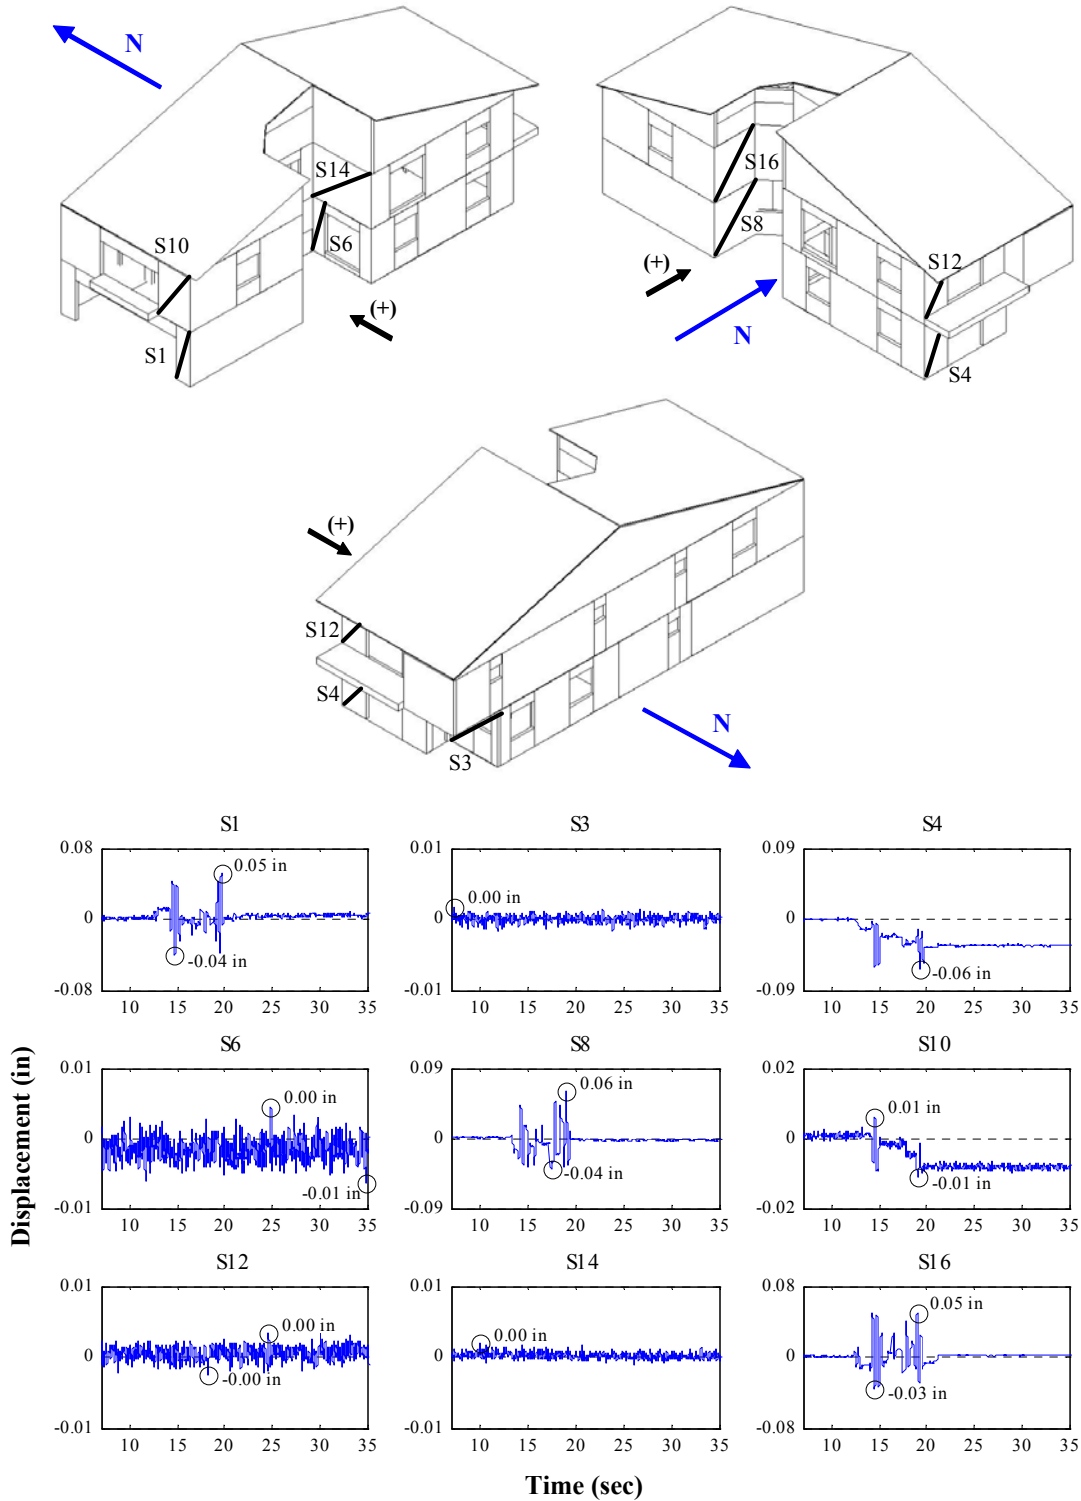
Wall deformations of north-south external walls for Test NWP2S06
